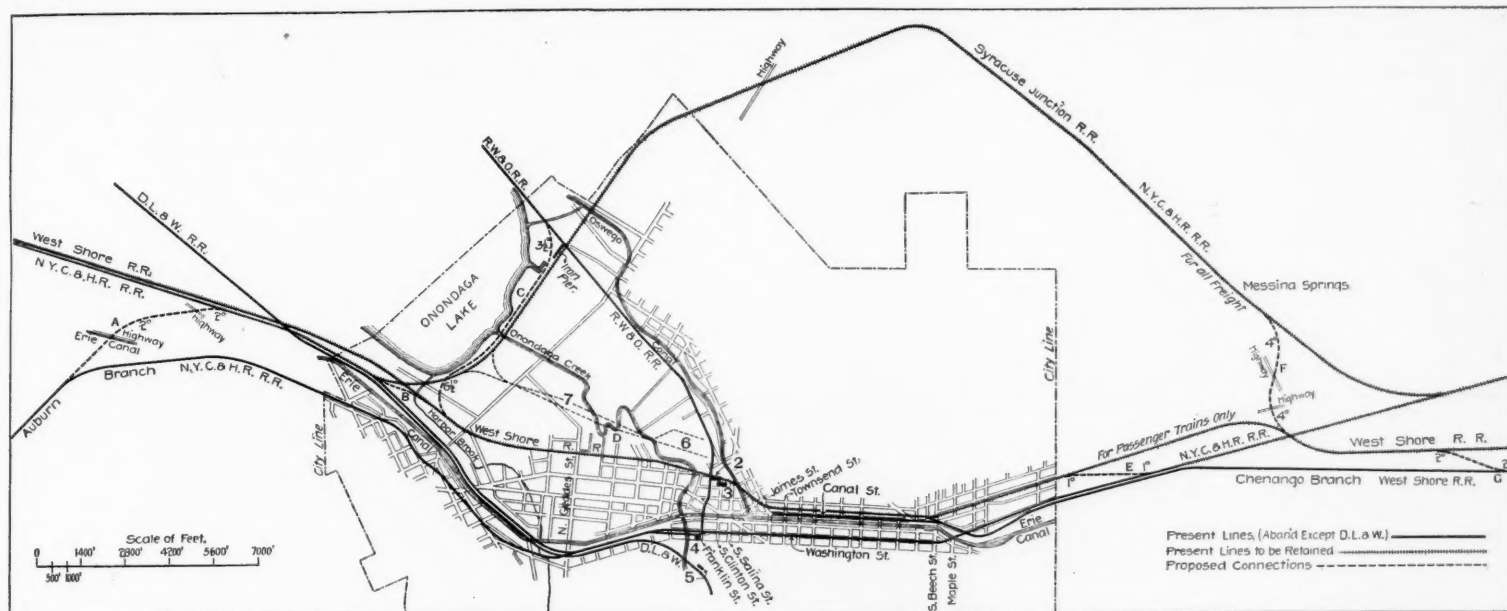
Proposed Arrangement of Tracks for Abolition of Grade Crossings at Syracuse, N. Y.
